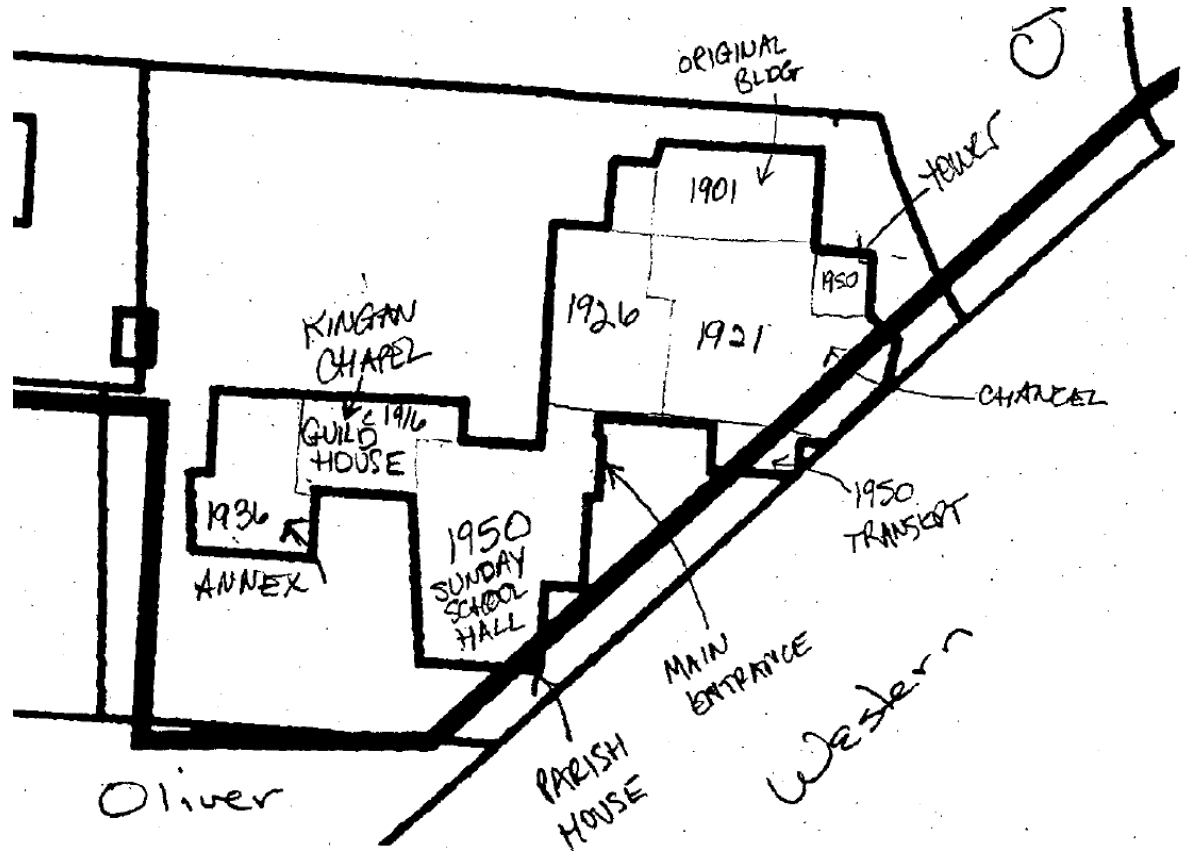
Plan outline of church additions in 1998 (Montgomery County Planning Staff, 1998).
